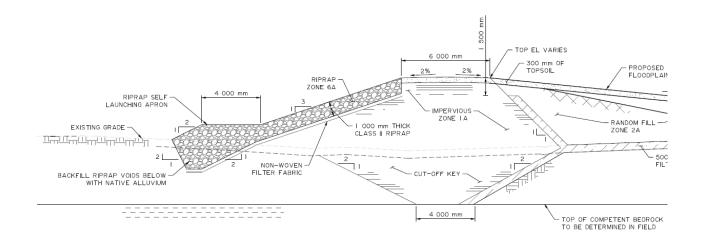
Typical Corss-Section of Armour for Floodplain Berm (Eathern Section)
